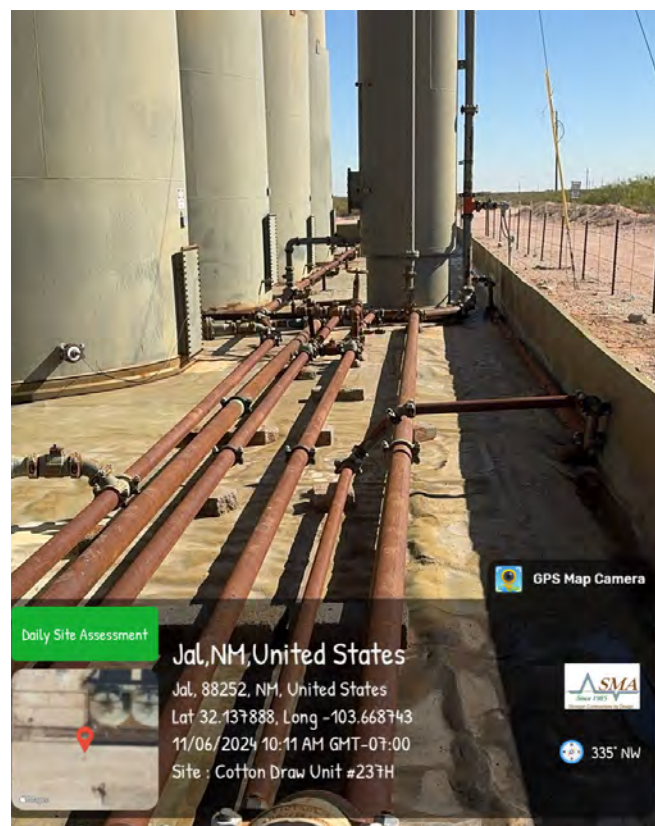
Facing northeast showing liner between tanks and under piping on southwest corner
